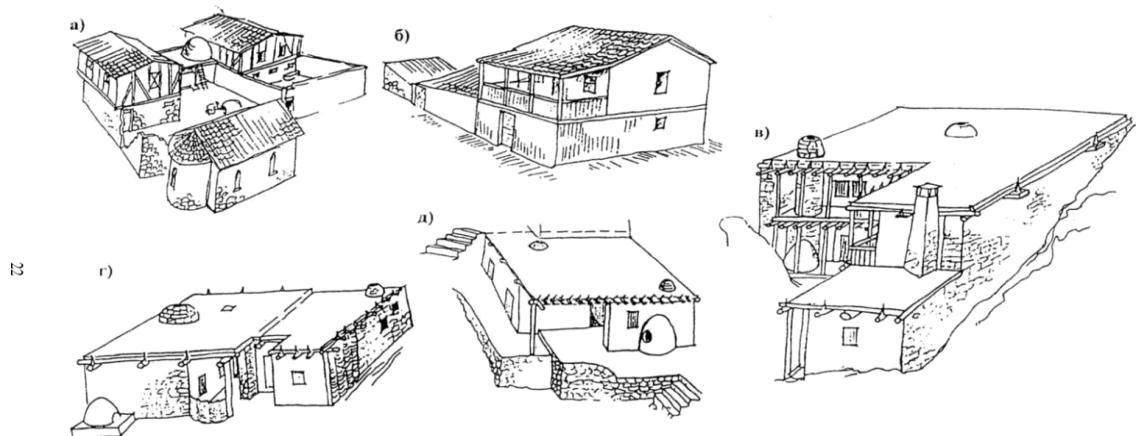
Buildings with a flexible frame-clay foundation based on examples of Crimean housing:
